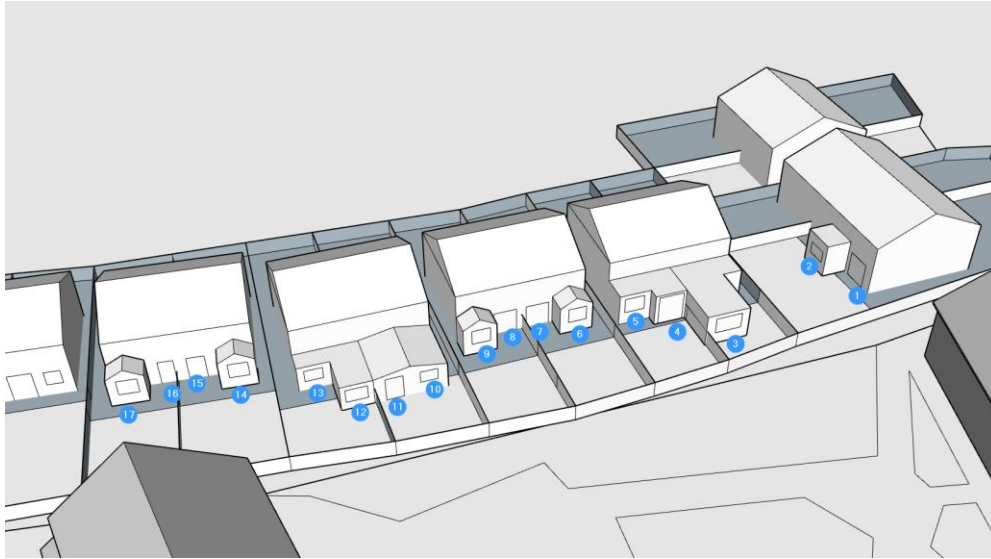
VSC Window Key Plan – Prospect Avenue (1)
